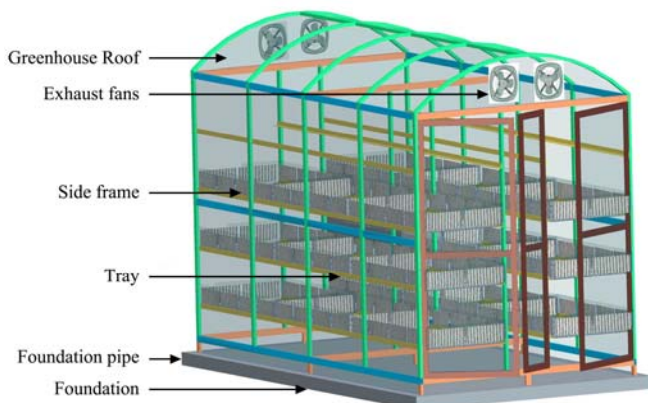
Structural details of designed PV ventilated hybrid greenhouse dryer
